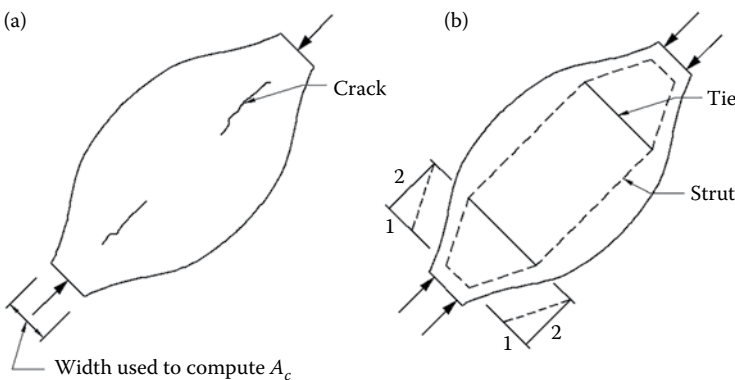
Bottle-shaped strut: (a) cracking of a strut; and (b) *STM* for transverse reinforcement.
